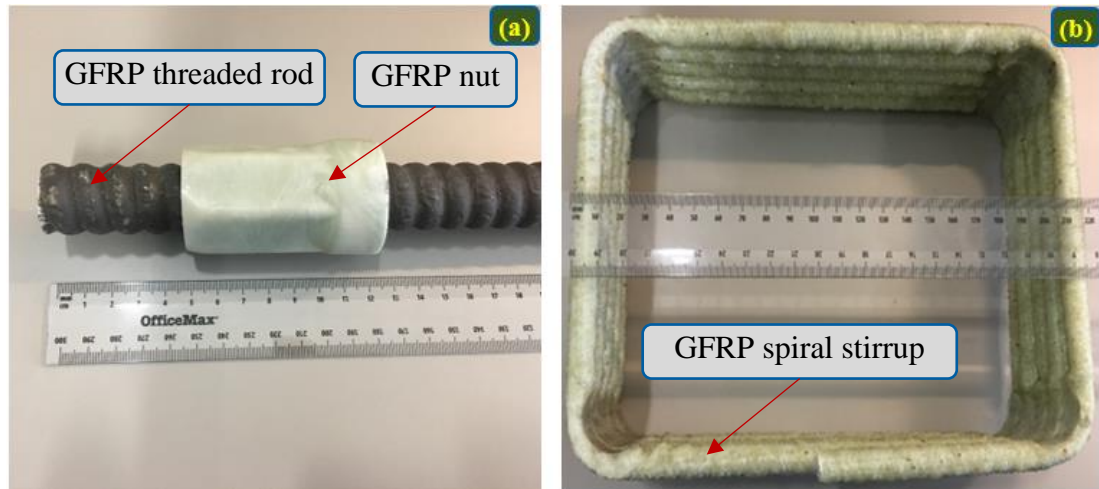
Details of (a) GFRP bolts and (b) GFRP spiral stirrups.
